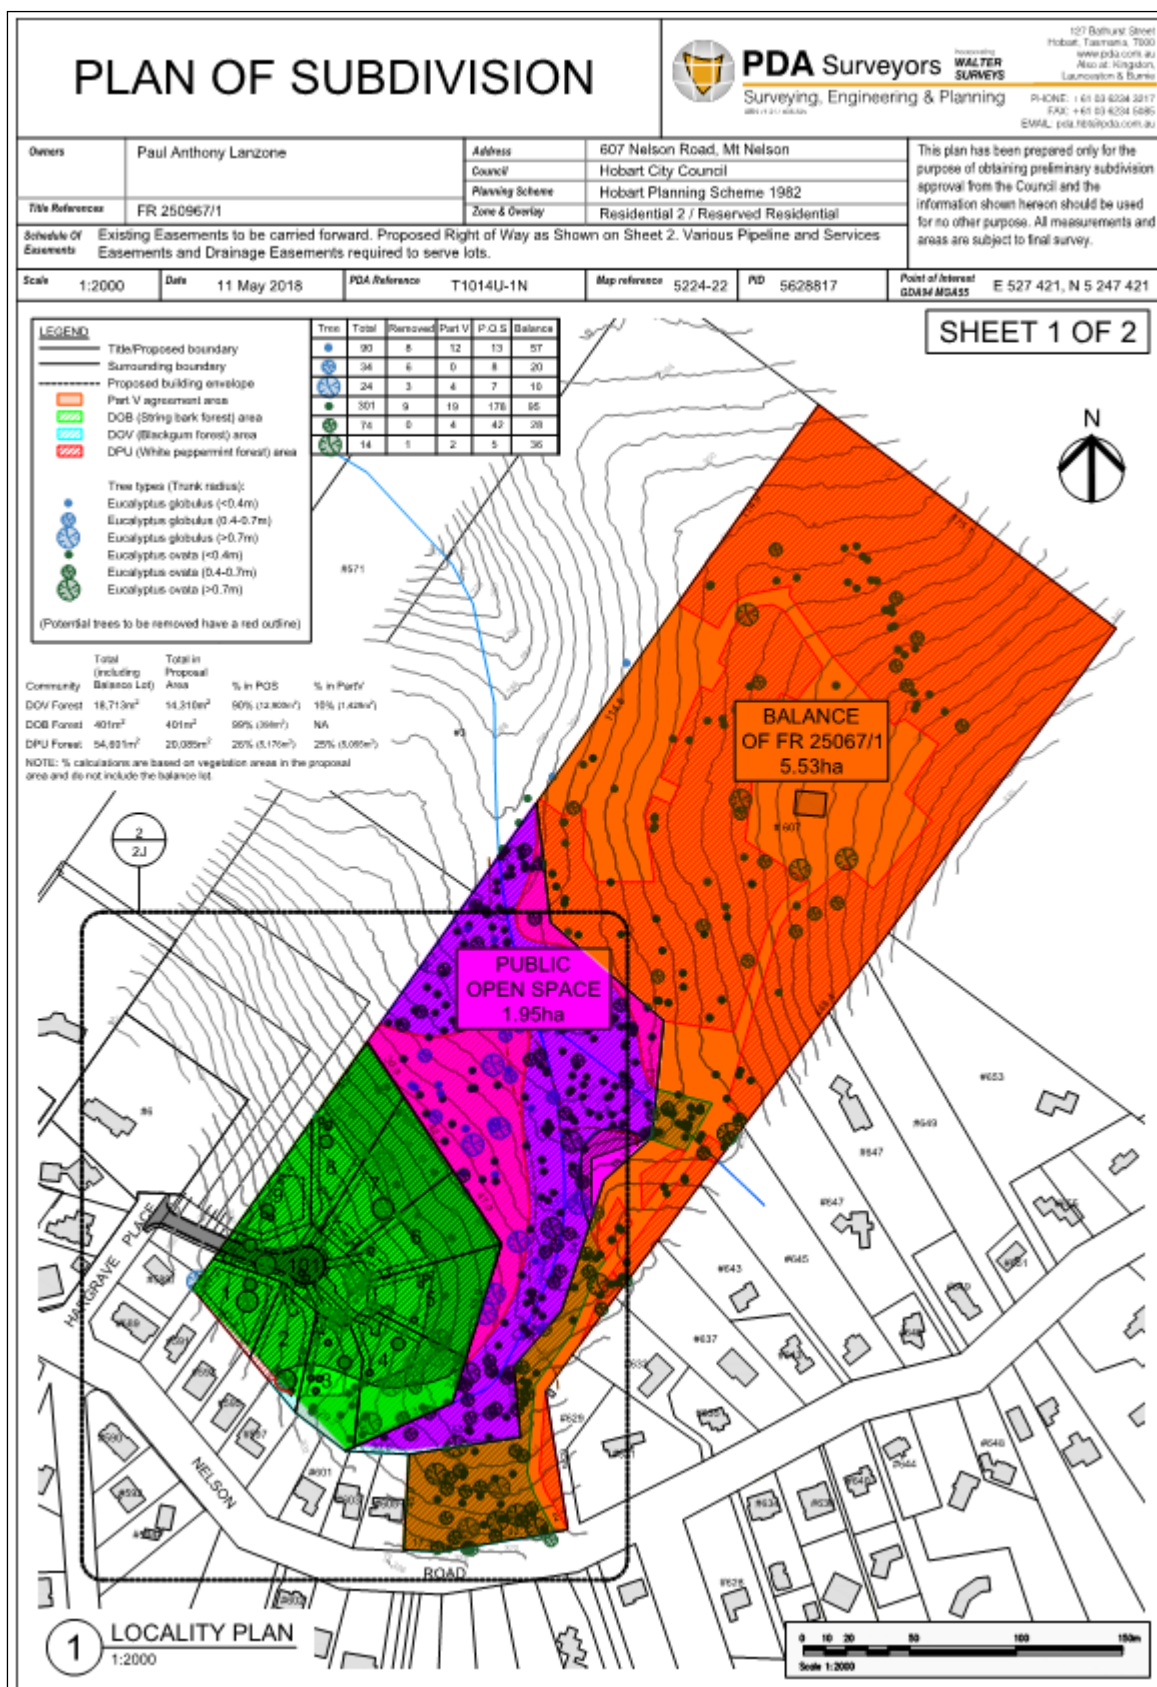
The proposed plan of subdivision. The nine additional lots (and road lot) are shown all highlighted green. The public open space lot is shown highlighted pink. The balance lot is shown highlighted orange.
